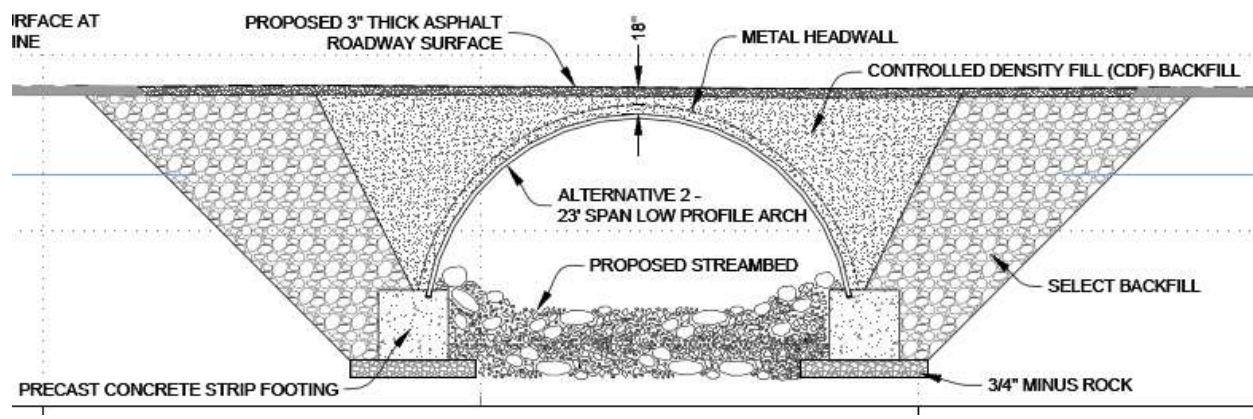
A typical open-bottom low profile arch culvert cross-section.
